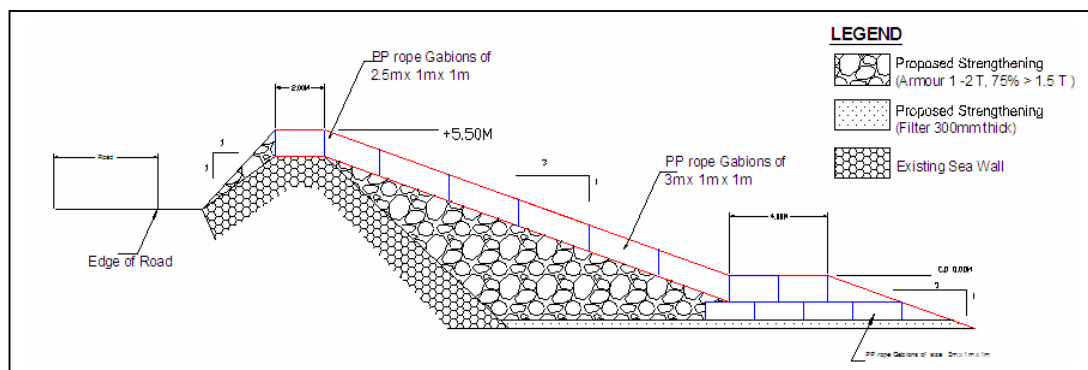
Typical cross section of sea wall using PP Gabions
